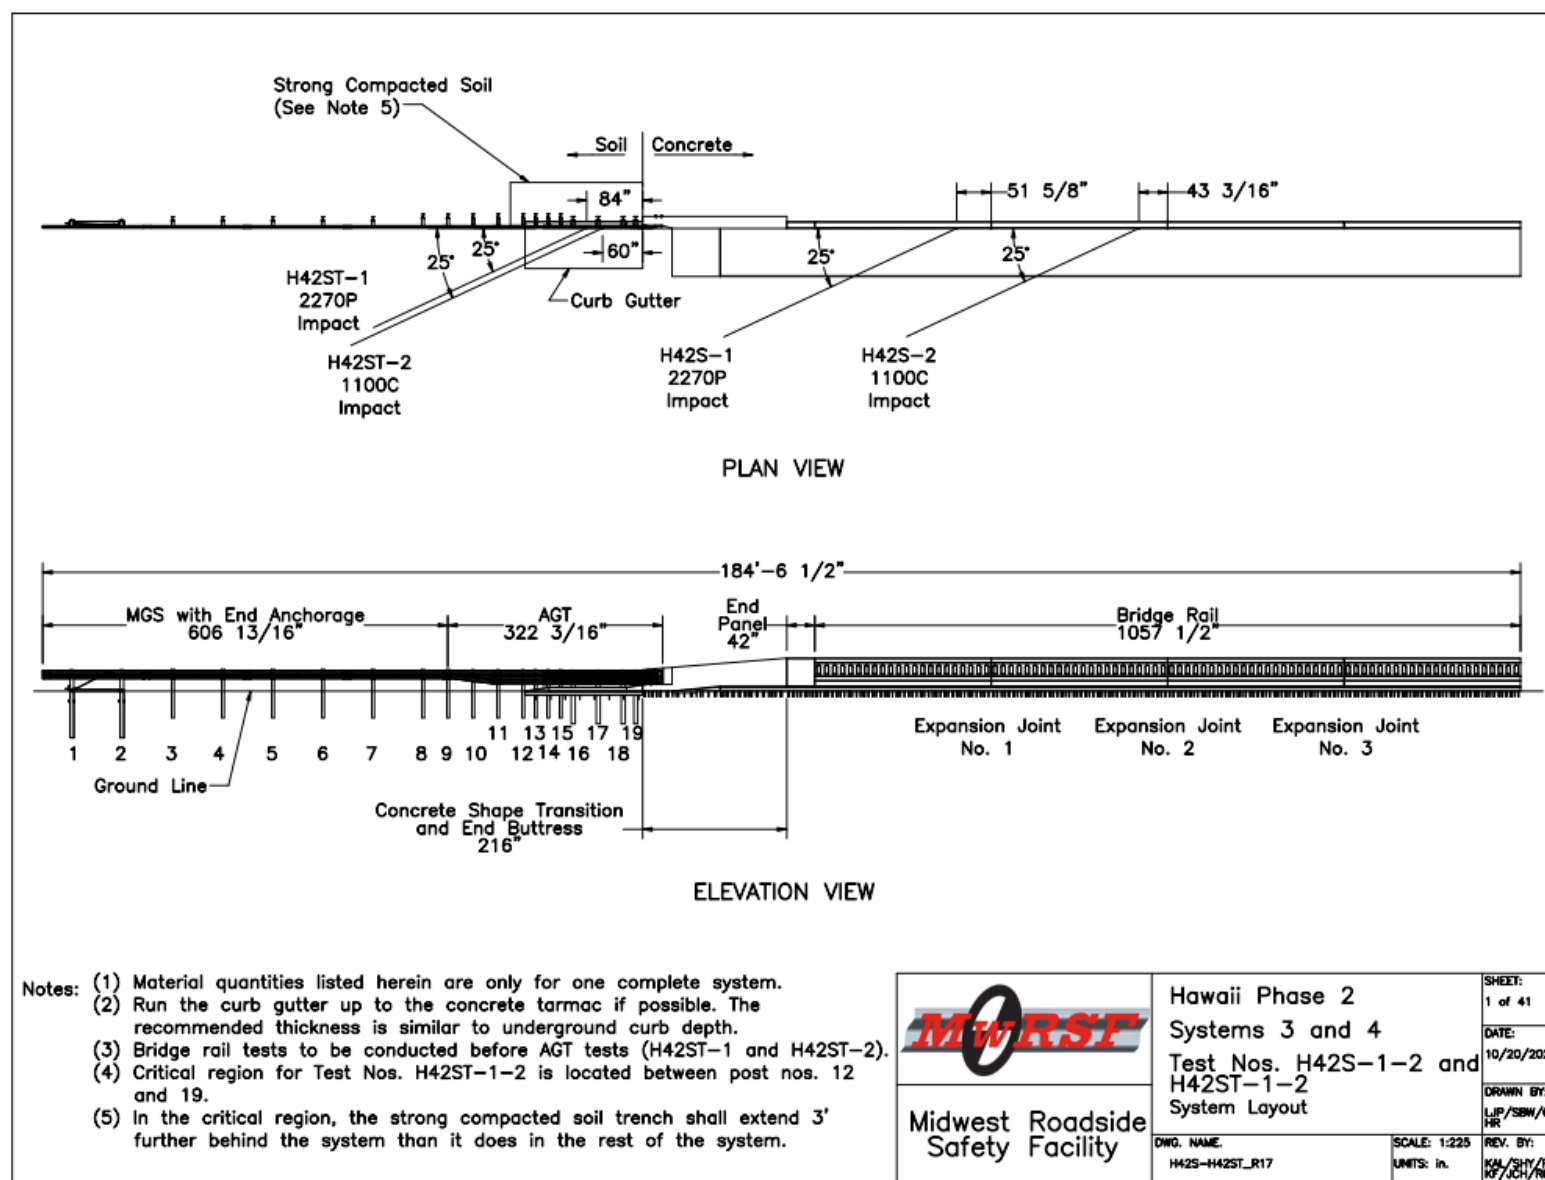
System Layout, Test Nos. H42ST-1 and H42ST-2
